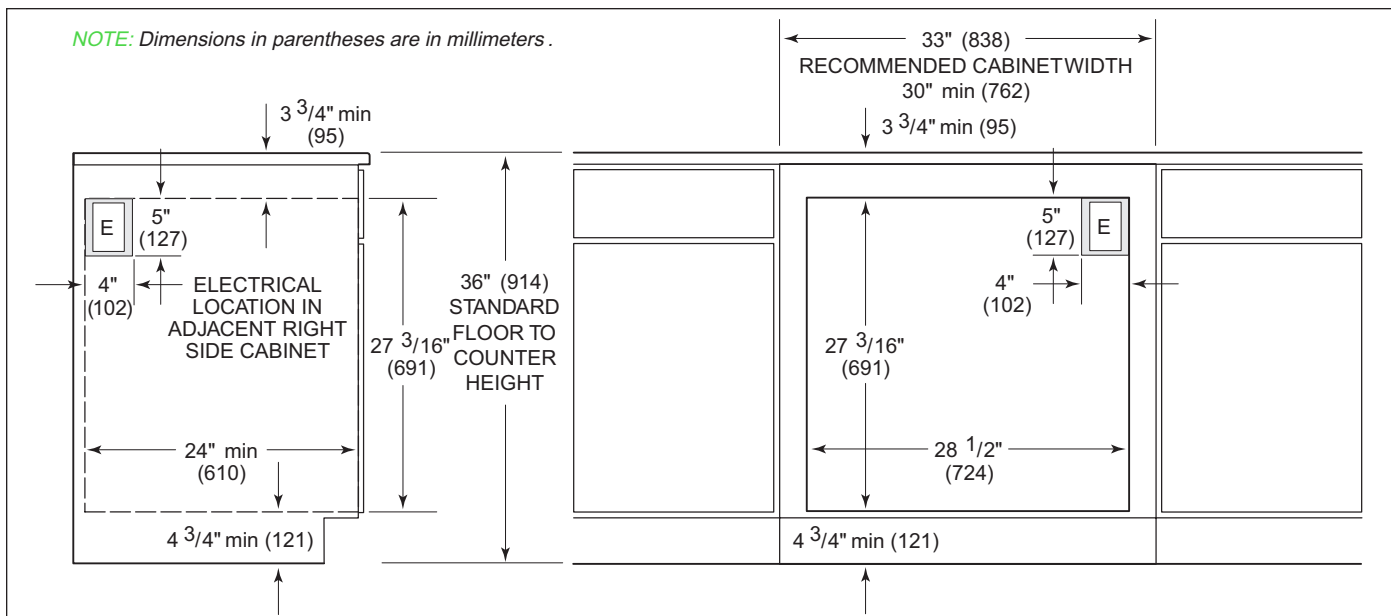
Undercounter Cutout Dimensions and Electrical Placement
